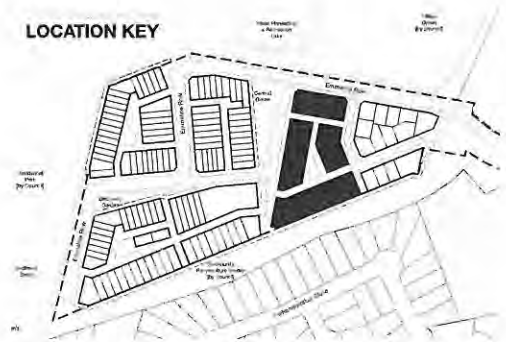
\_STAMFORD PARK LANE CONCEPT PLAN
